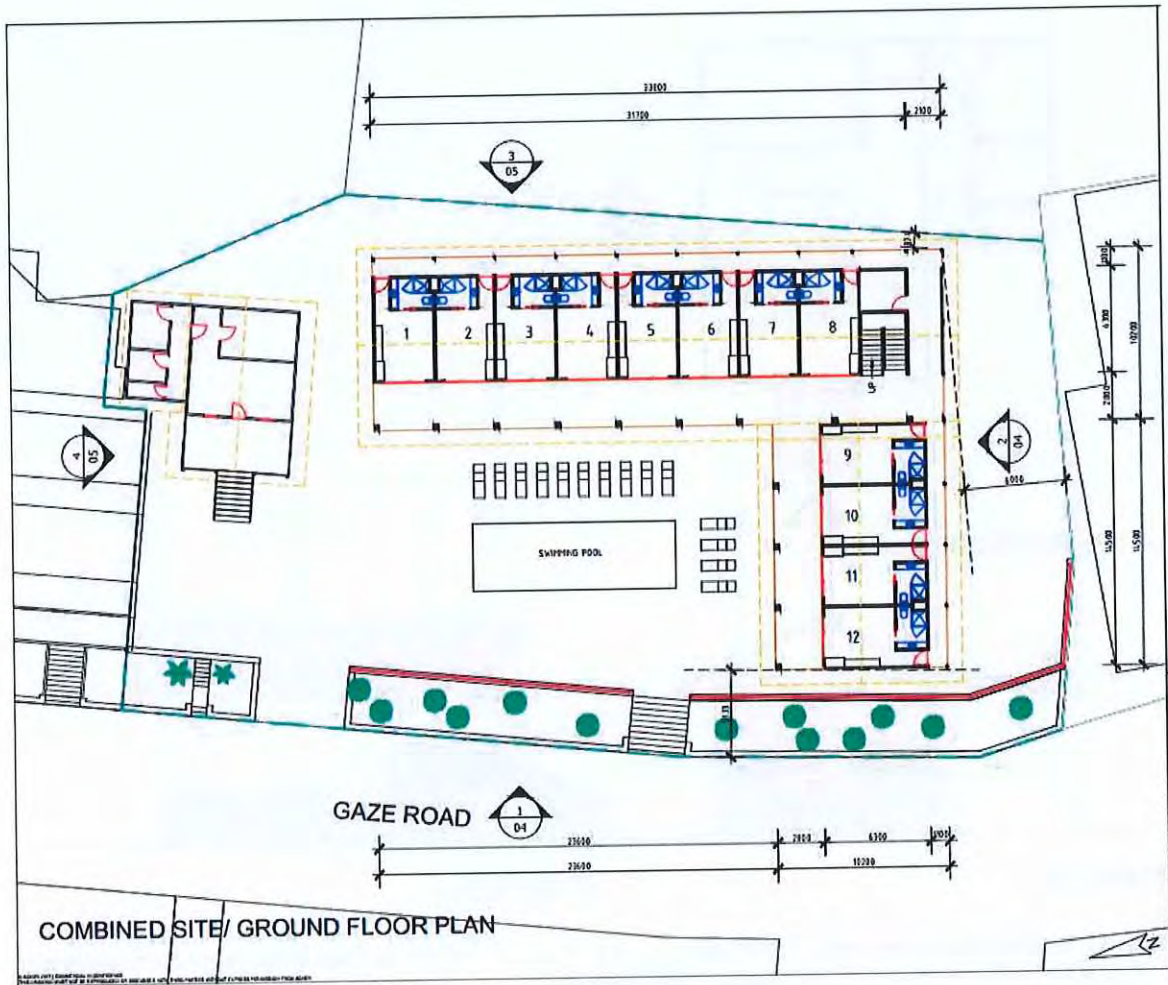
Combined site/ground floor plan for the new hotel and refurbished Former Labour Contractor's Quarters. (Source: Acker, 2018)
